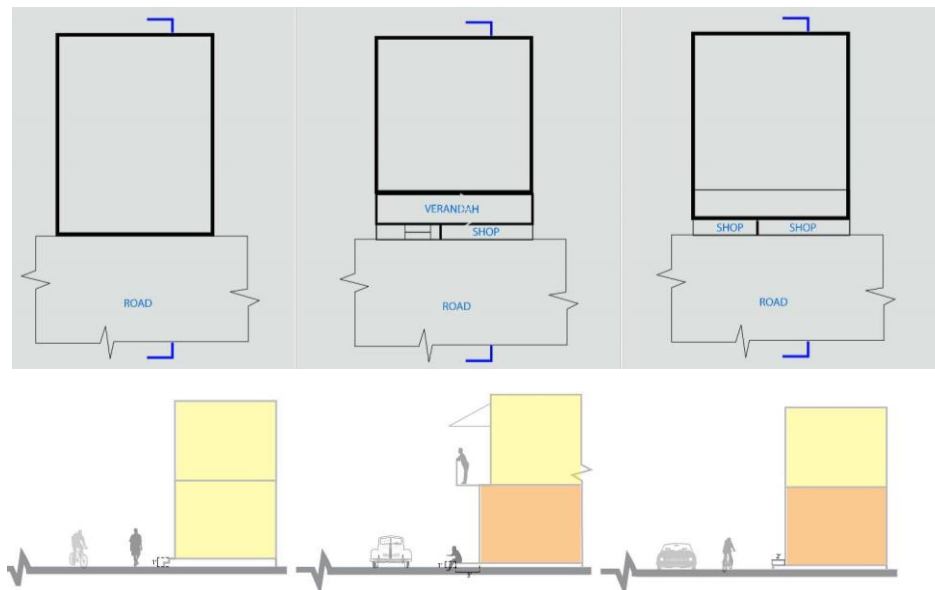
, Spatial Connection between indoor, semi outdoor and outdoor
